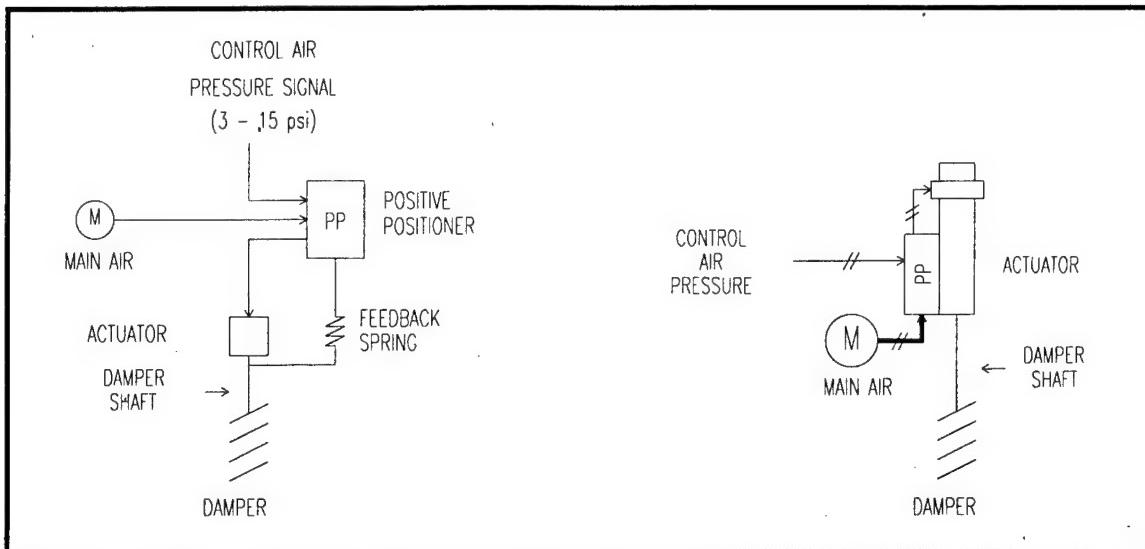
Positive positioner applied to a damper (left) and its standard drawing symbol (right).
